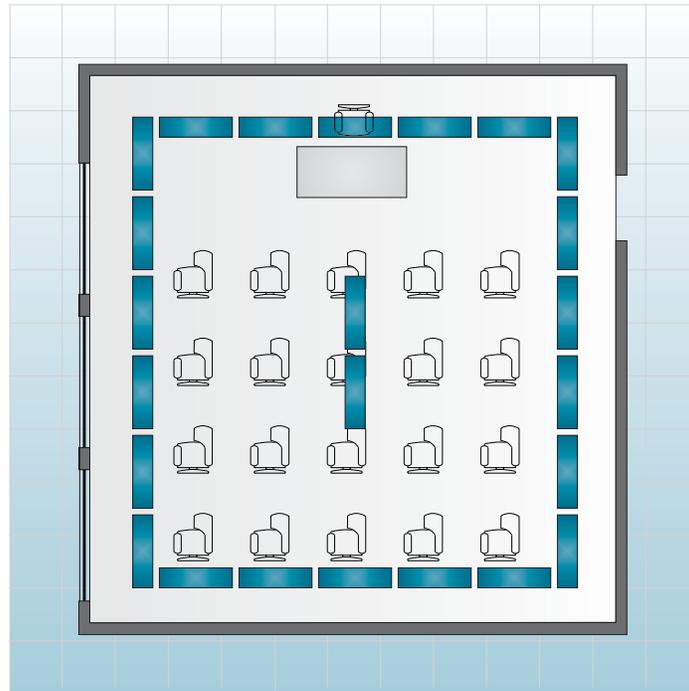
Lighting Application, Classroom, "Donut" Layout
